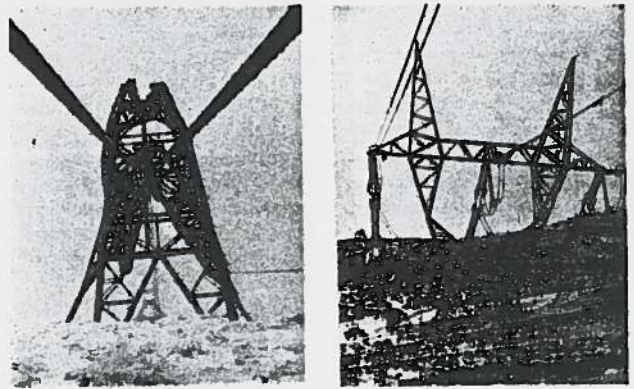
Collapsed towers on the Gökçekaya - Seyitömer line. Right: anchor tower; left: suspension tower.
